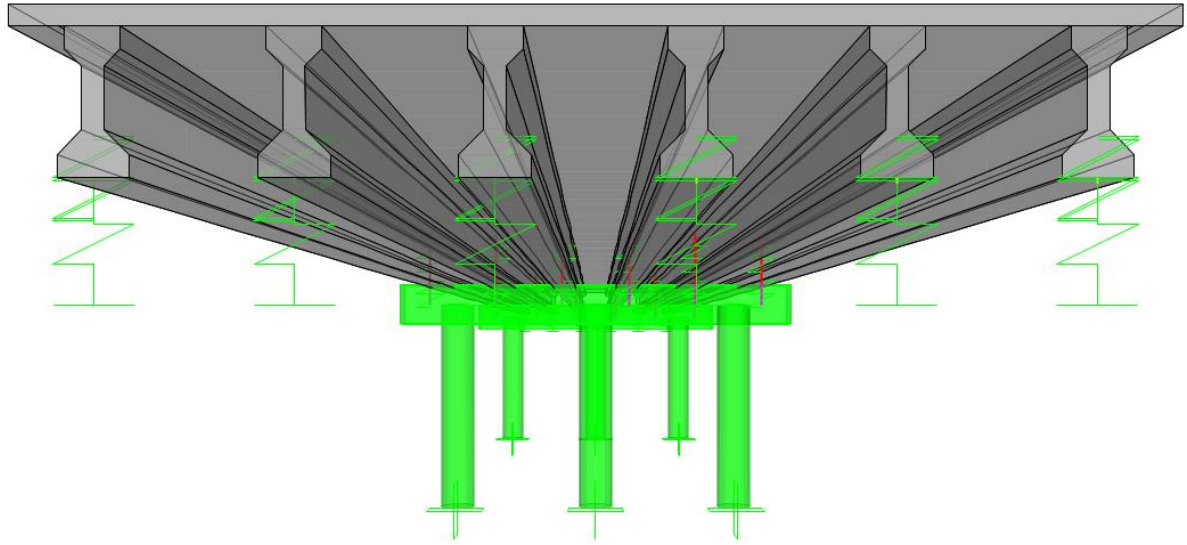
3D Bridge model, superstructure & substructure - CSi Bridge
